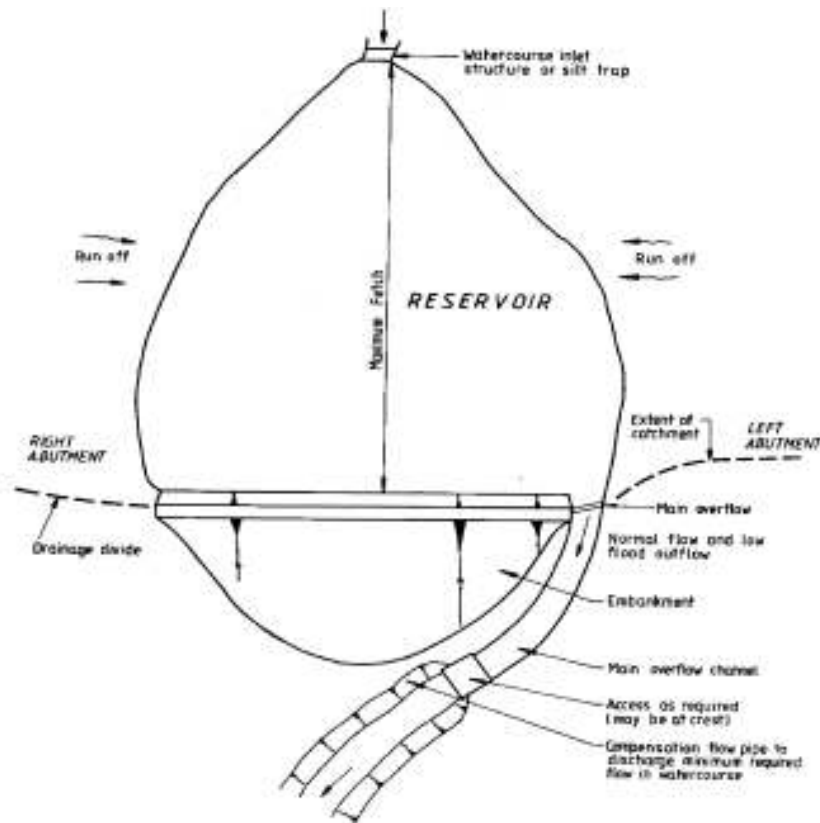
Plan of a generic earthfill embankment dam and its reservoir¹
